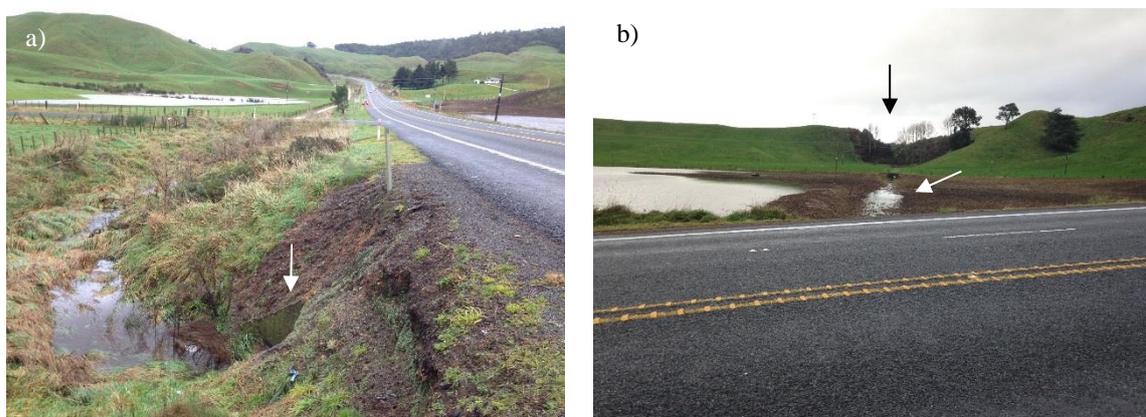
The existing surface drainage is too high to drain water ponding in the area. a) Culvert (as indicated by arrow) supposed to drain water from ditch on the east side of the road to swale on west side. b) Swale (white arrow) supposed to drain water to gully downstream (black arrow).
